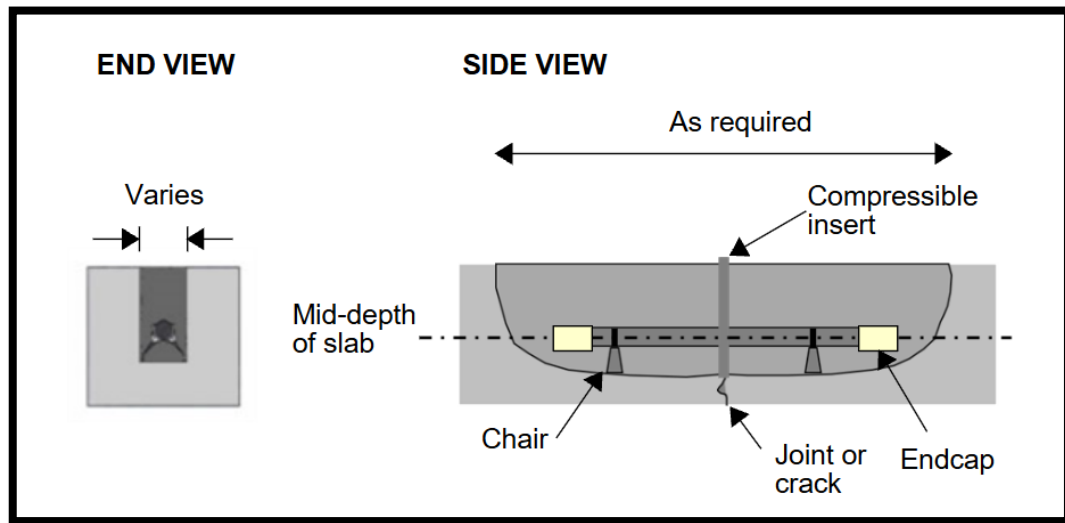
Placement of Dowel Bars (AASHTO T3: Pavement Preservation: Dowel Bar Retrofit, Cross Stitching, and Slot Stitching)
